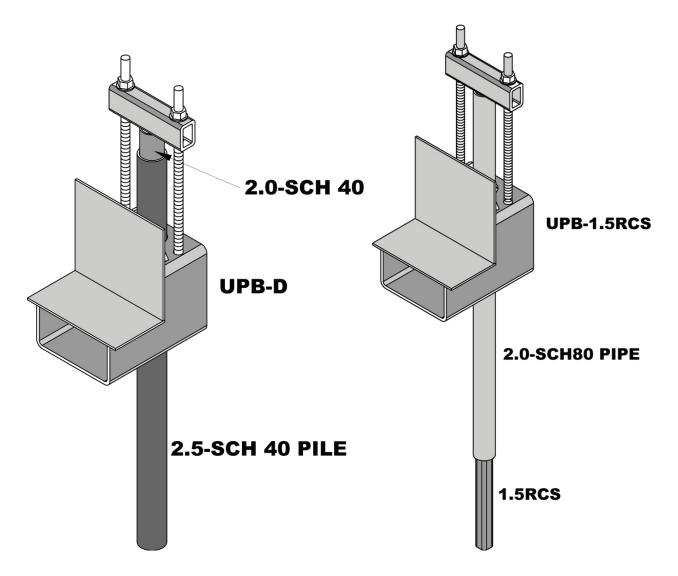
FOUNDATION REPAIR BRACKET (UPB-BD SHOWN)
